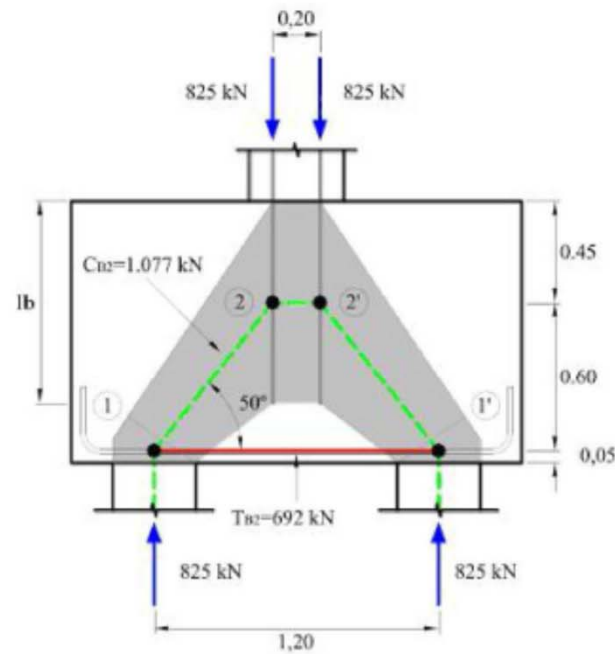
Model B2: compressive forces of column reinforcement (dimensions in m)
